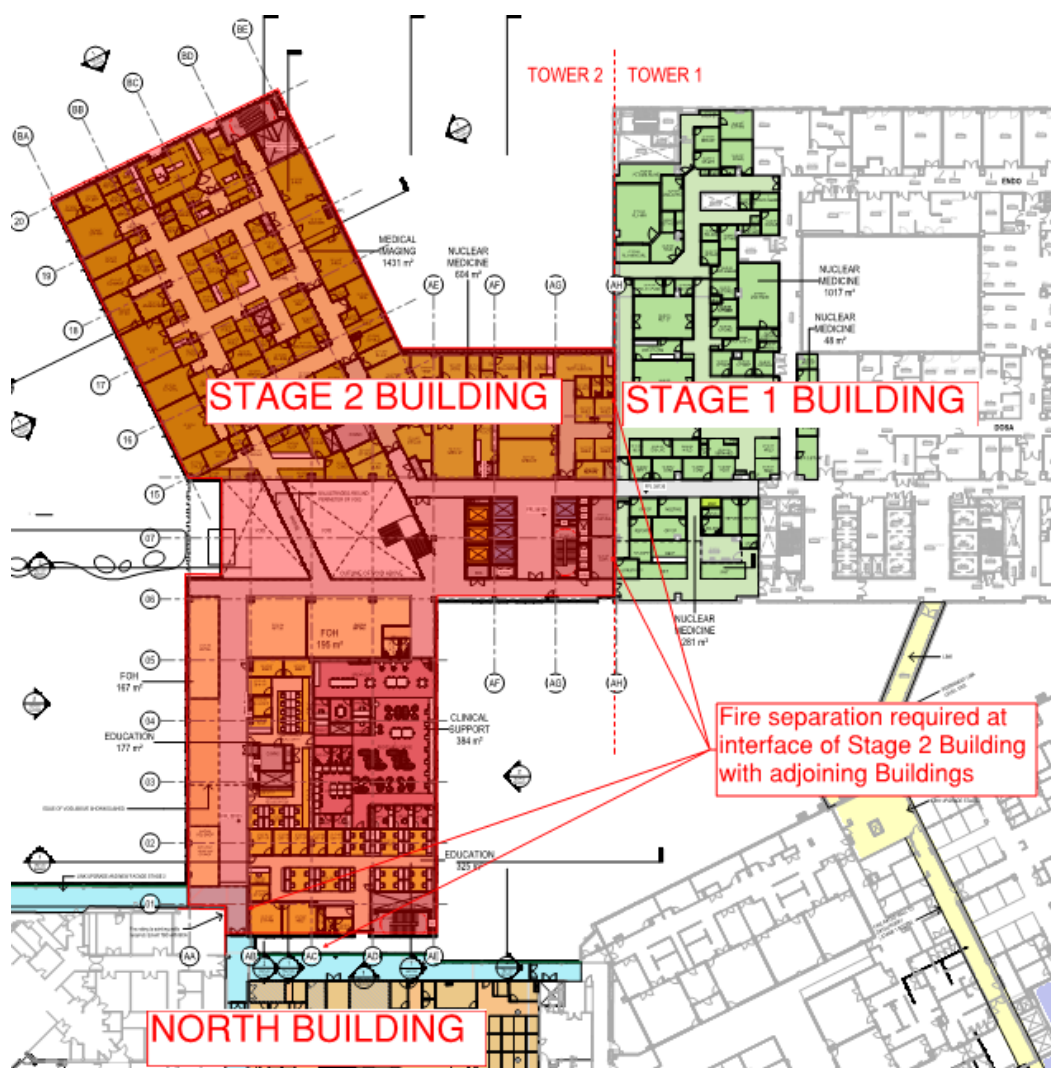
Required fire separation of Stage 2 Tower from existing adjoining buildings on Level 02
